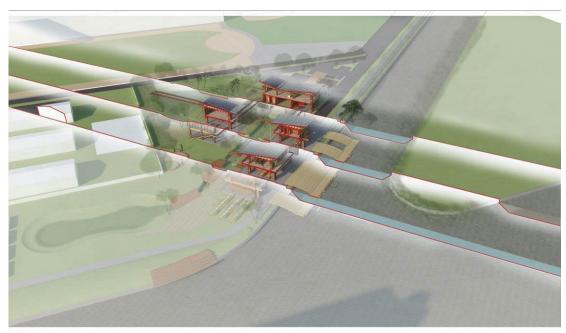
Multi-Section Waikiki Wa'a Cultural Center (Source: Author, Justin Manongdo)
